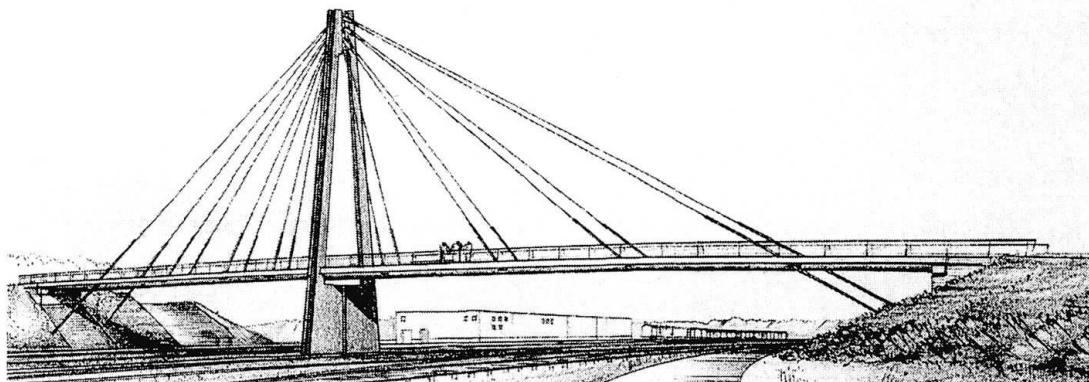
Artist's impression of Herning footbridge, courtesy Møller & Grønborg Architects and Planners
